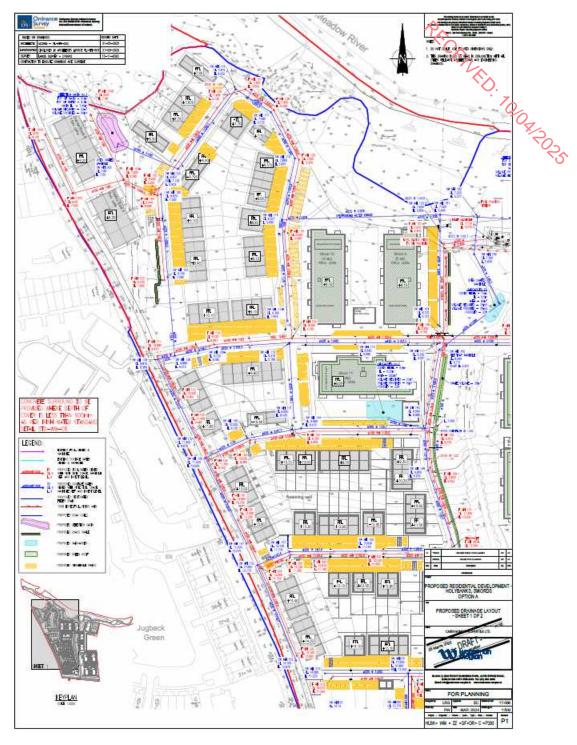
SURFACE AND FOUL WATER DRAINAGE (WESTERN) (TOWNHOUSE) (DRG NO. P200, WATERMAN MOYLAN 2025).
